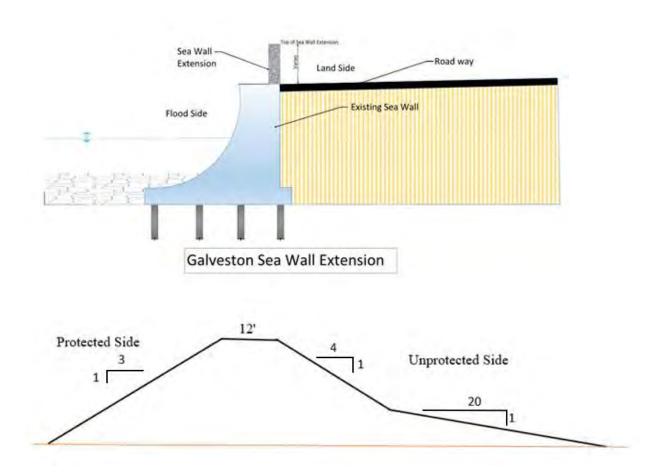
Preliminary cross sections provided by the USACE for the Galveston Seawall Extension (top) and Galveston Ring Levee (bottom).
